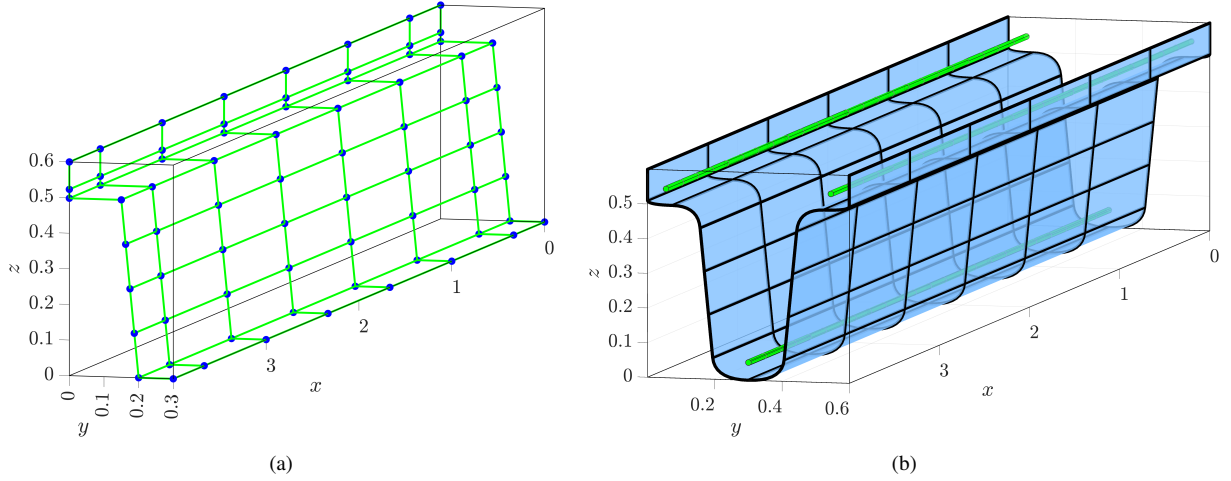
Initial configuration of the beam: (a) control polygon, (b) outer surface of the beam (half span). The prestressing cables are shown in green.
